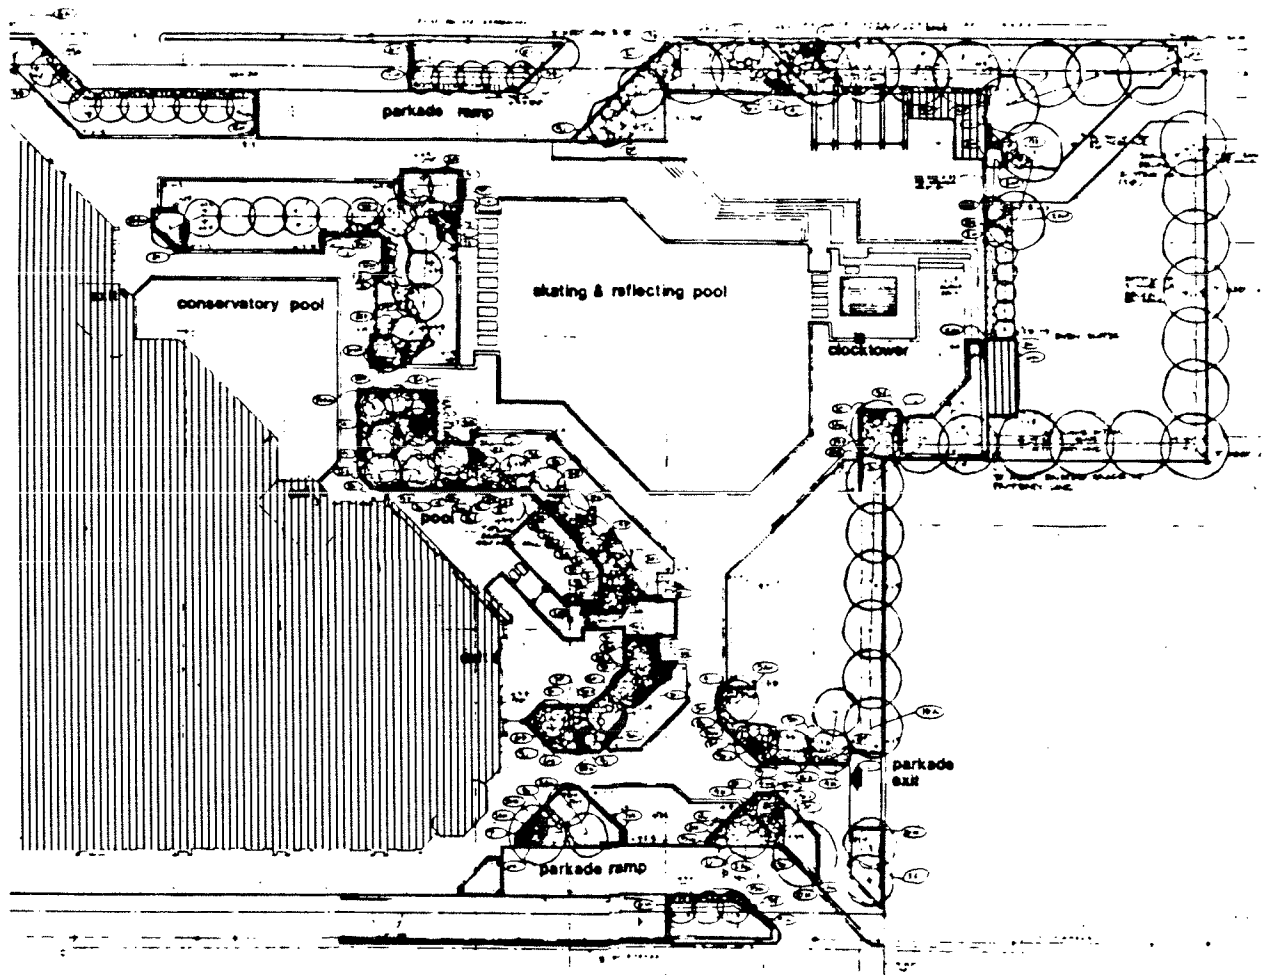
Plan of Winnipeg Centennial Library Roof Garden (From Lee, 1982.)
